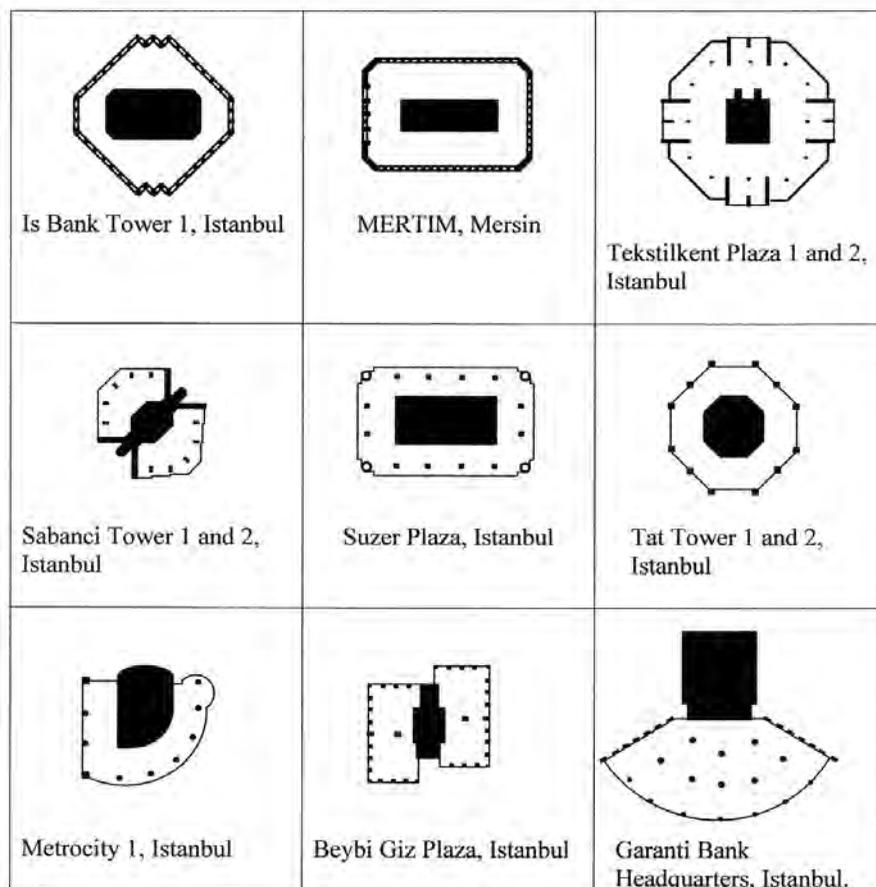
Geometry of typical floor plans of ten tallest office buildings in Turkey.
